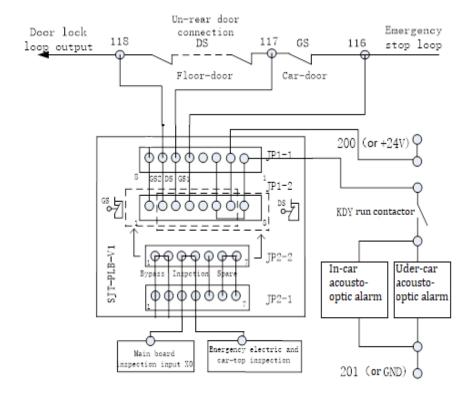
BL3000 series elevator control board un-rear door bypass plan
